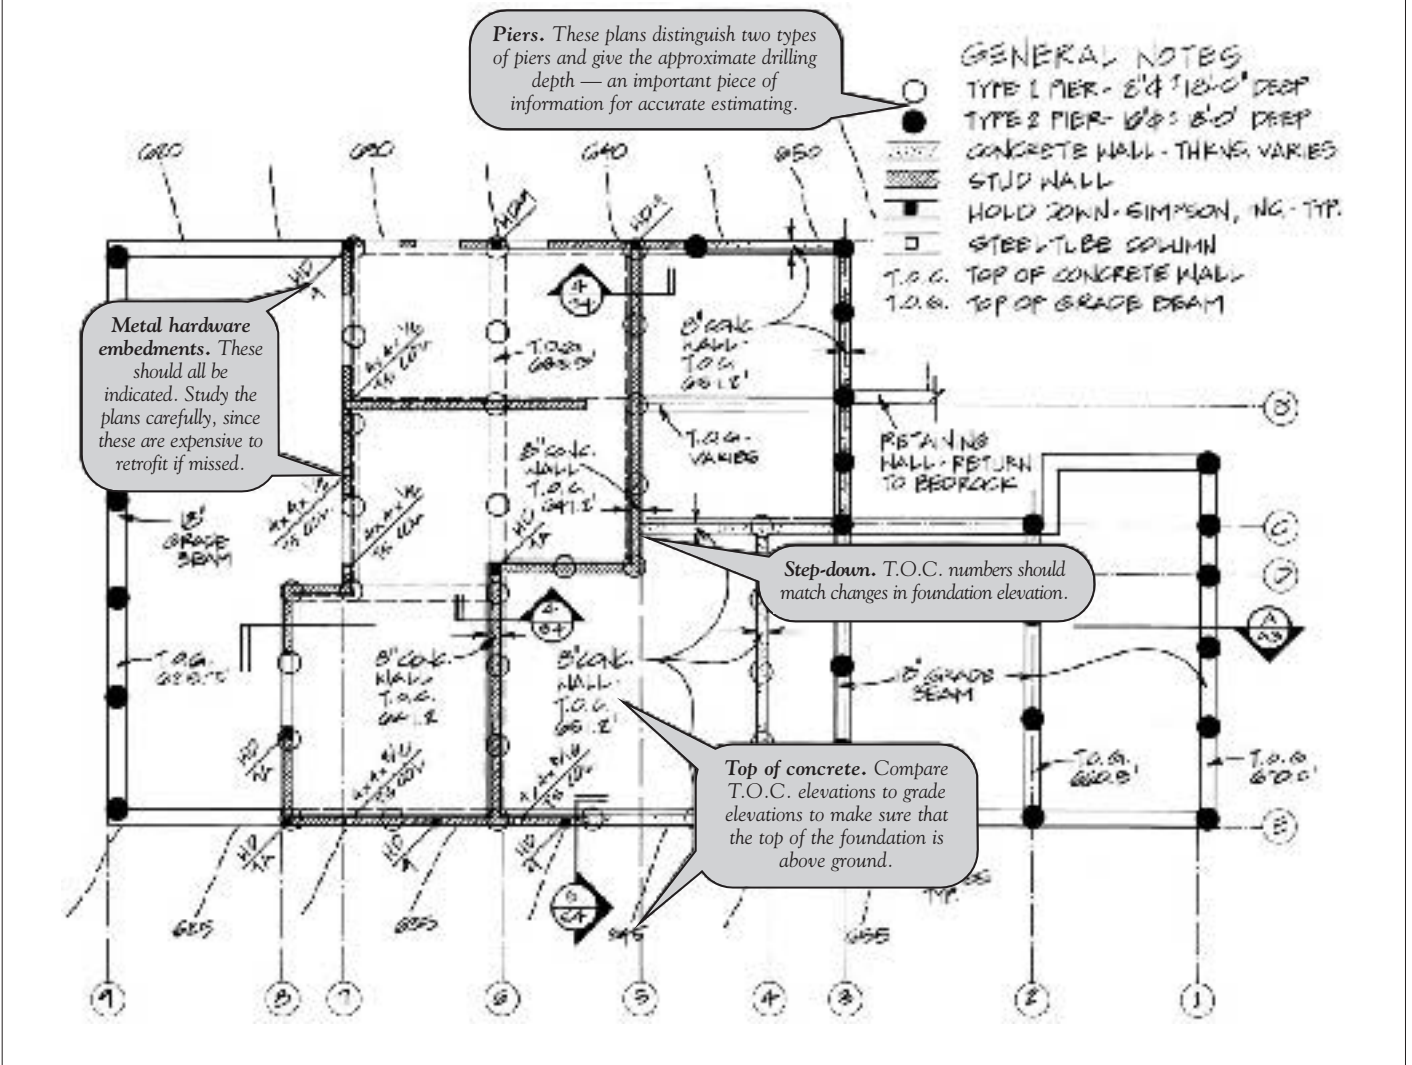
Building hillside foundations requires accurate and complete structural plans. Check pier locations, hardware embedments, and changes in top-of-concrete elevations.
